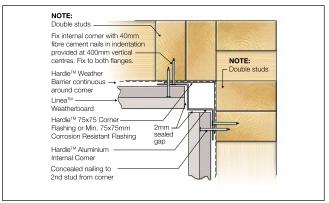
INTERNAL CORNER MOULD DETAIL
